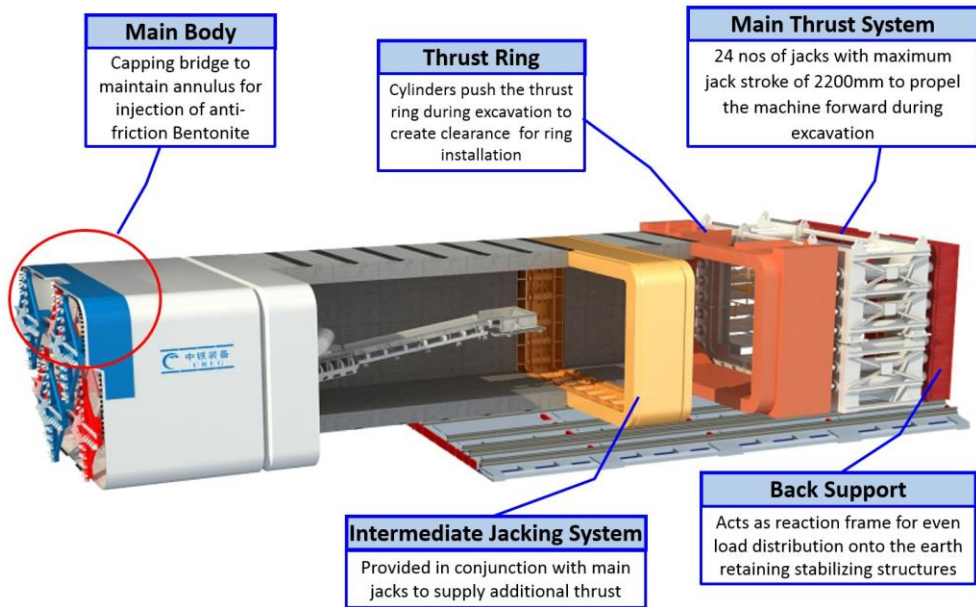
Side View of Rectangular Pipe Jacking Machine (www.drillcuttingbit.com)
